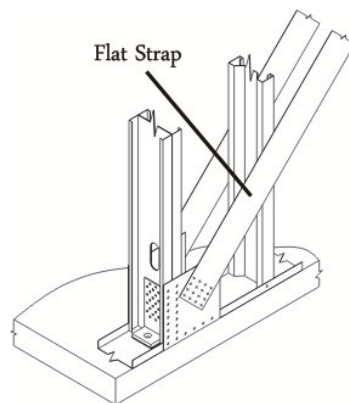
Detail of a corner in “all-steel” walls (Fülöp & Dubina, 2004a)
